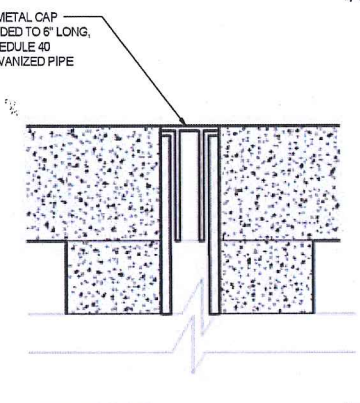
DETAIL - PARKING SIGN AT ENTRY TO PARKING 2.25
